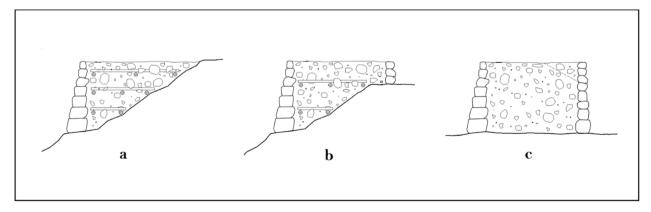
Schematic cross sections of the walls of 5th century CE strongholds of mainland Sweden: a) terrace wall; b) semi-terrace wall; and c) freestanding drystone wall-and-fill rampart (sw. skalmur). The wooden parapet is not included in these drawings. Broborg's inner enclosure wall was constructed as (b). Drawing by Anders Bornfalk Back.
